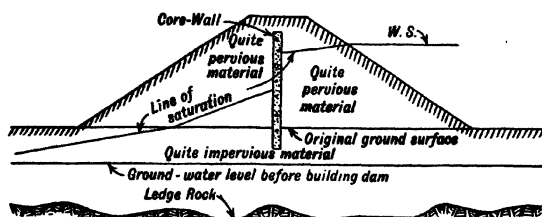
Core-wall in Dam of Pervious Material on Foundation of Quite Impervious Material.
